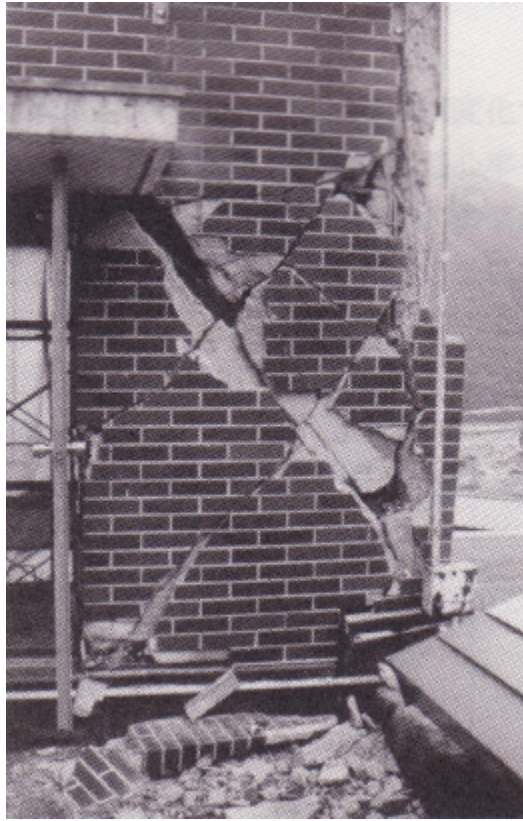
Large see-through cracks on the wall with significantly-bent wall reinforcement.
